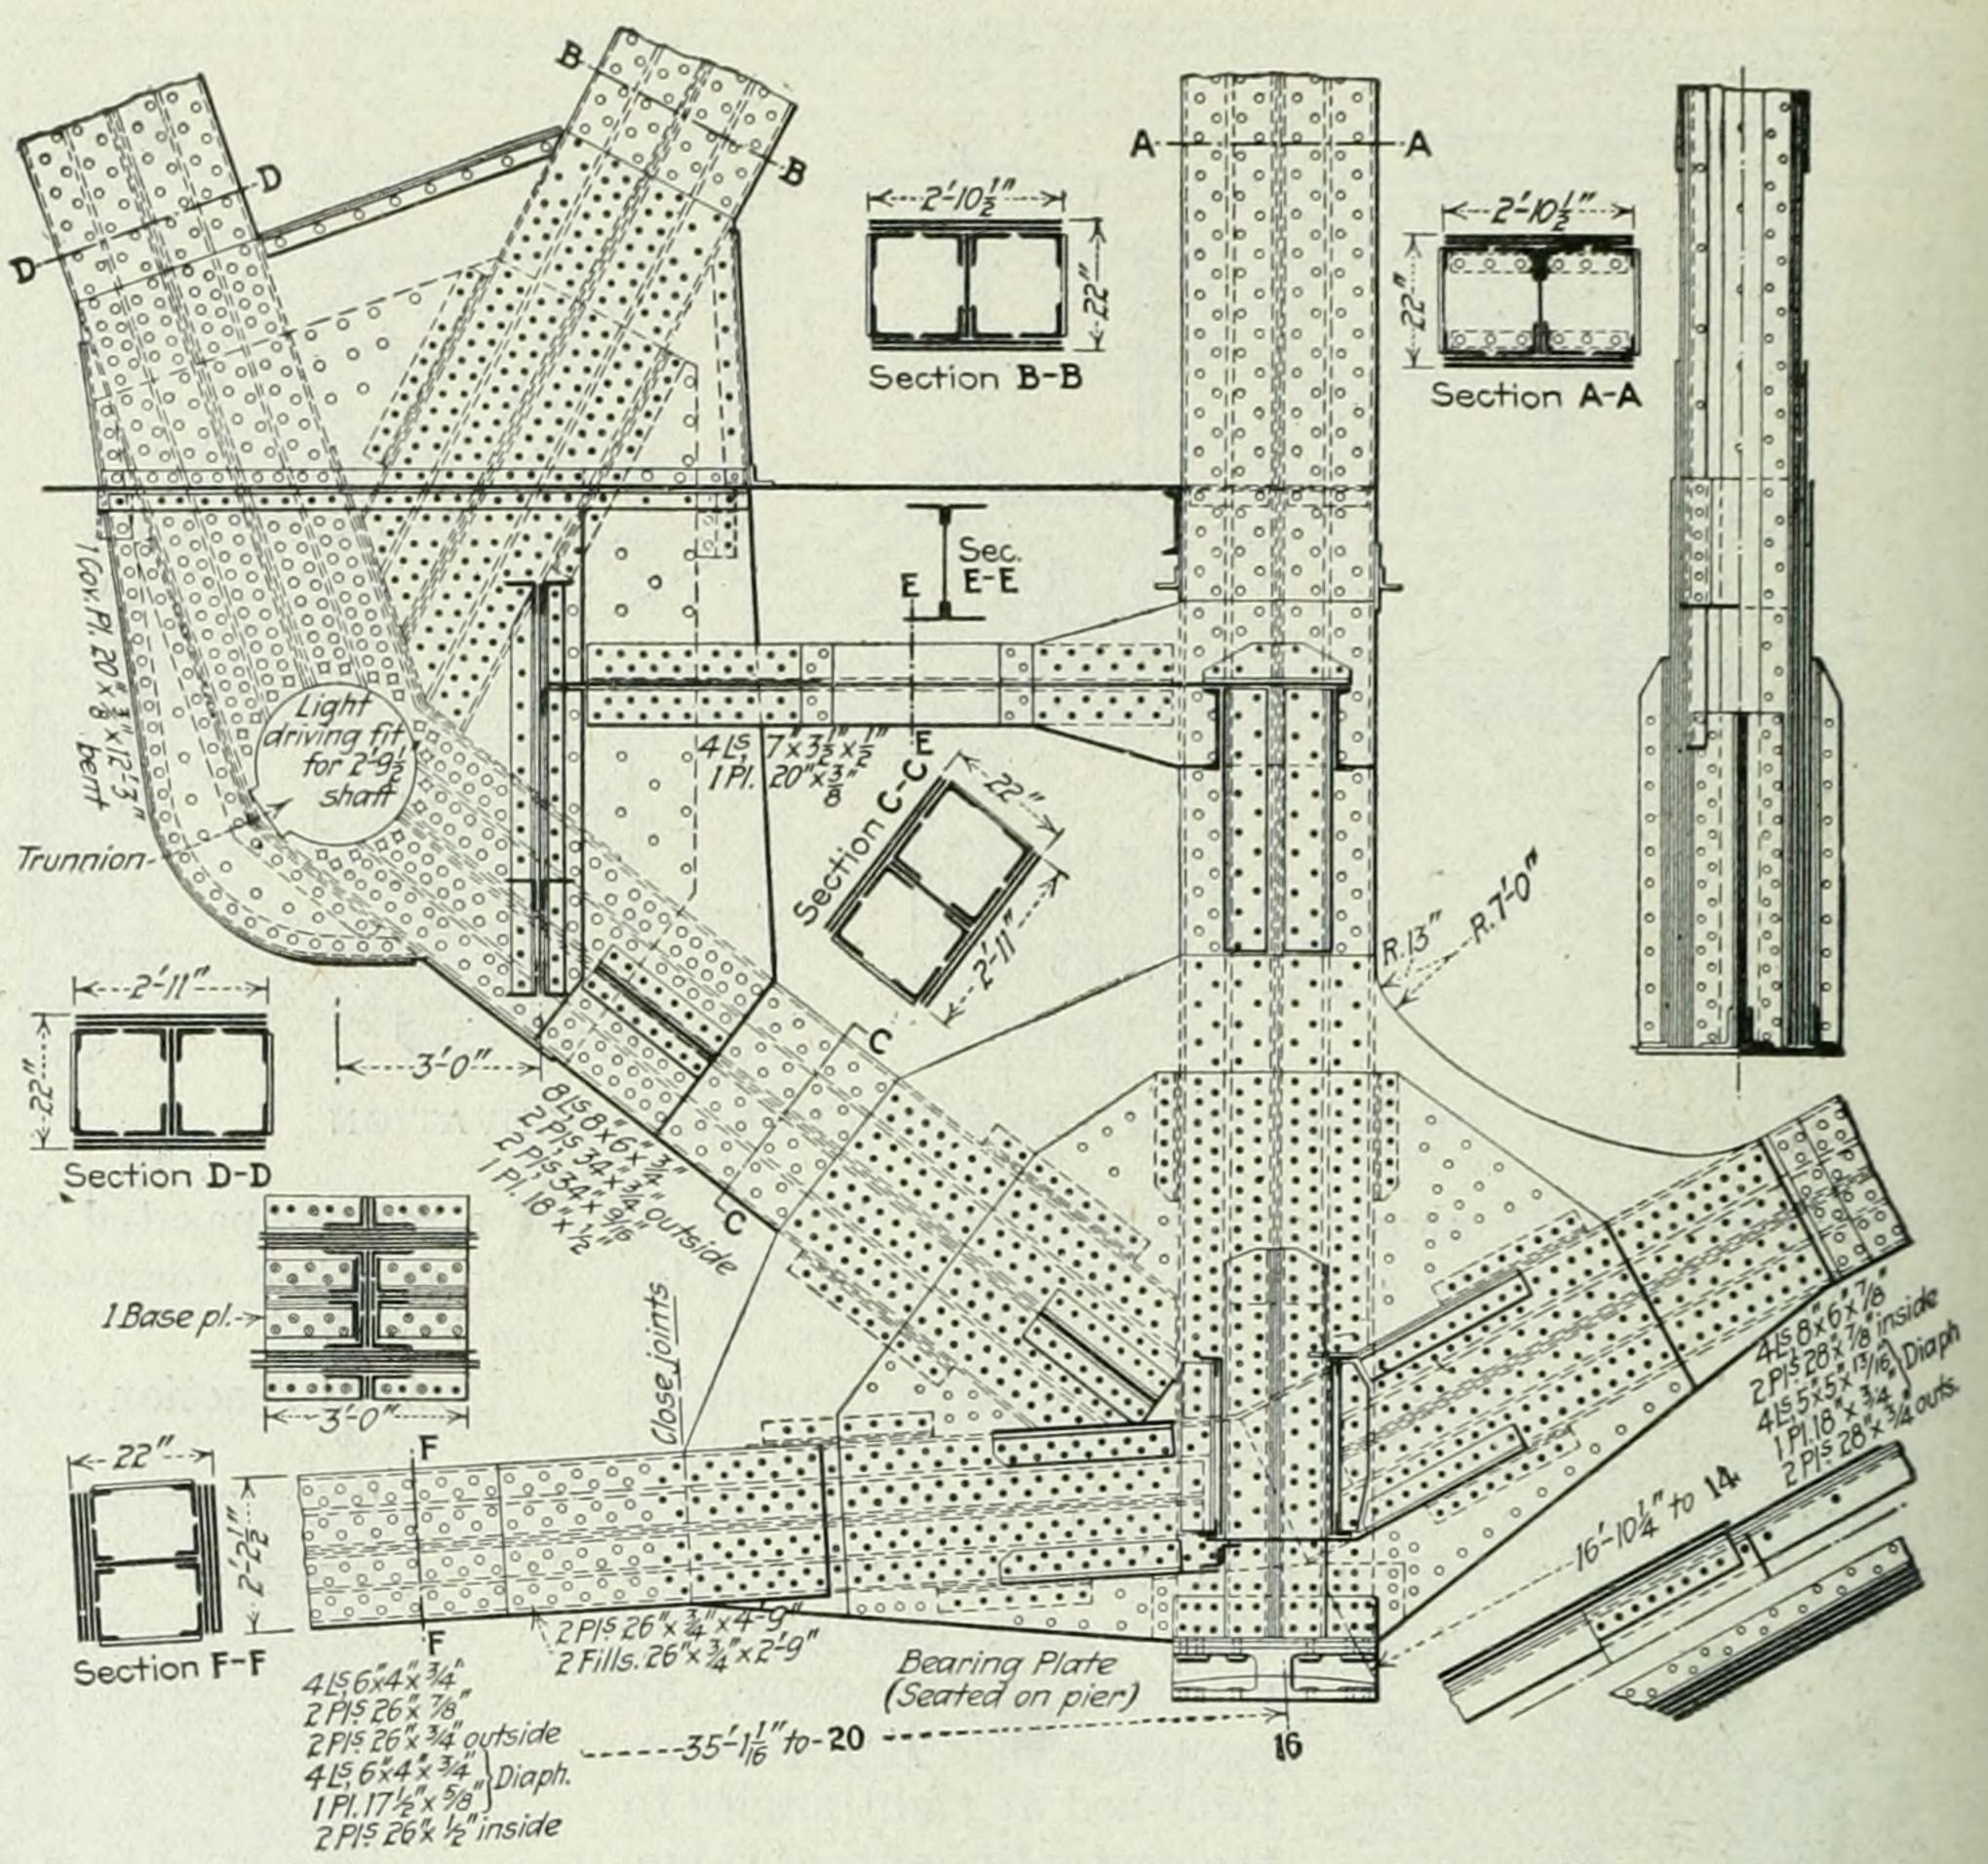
TRUSS MEMBERS AT TRUNNION BEARING
